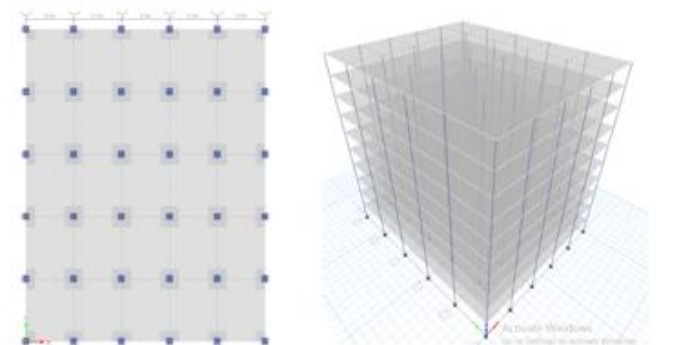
Plan and 3-D view of proposed conventional slab building
